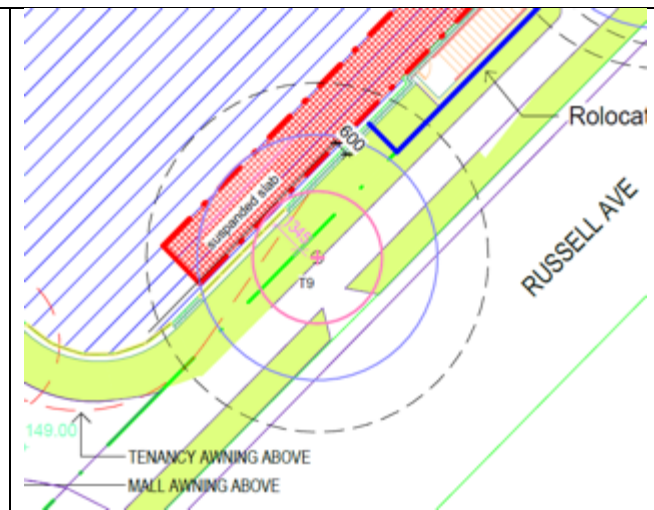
Level 0 Plan - Tree 9 Showing roof space, suspended slab (couter level).
